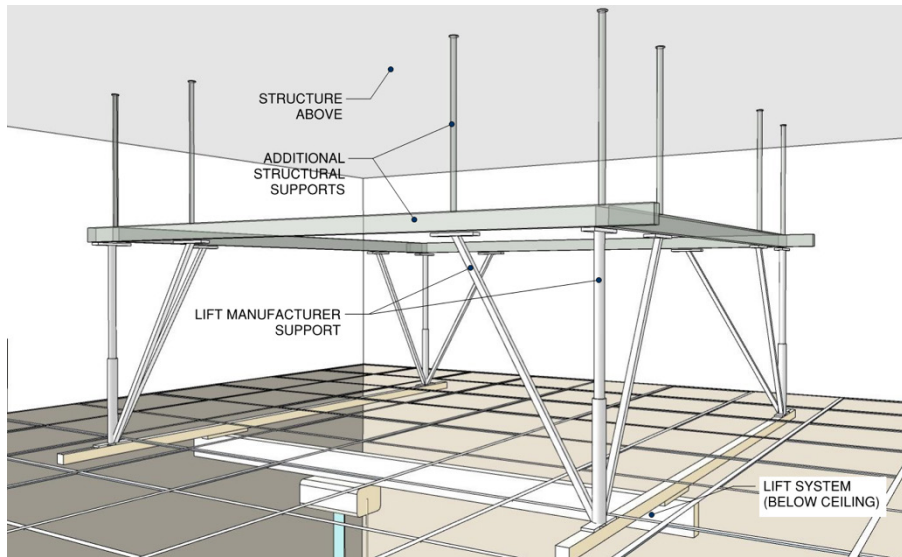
The illustration above represents an additional structural frame for bridging between the manufacturer provided supports and the underside of structure above. The “Additional Structural Support” is designed and installed by a construction contractor separately from the manufacturer. Refer to section 2.8.2.2 for specific structural support installation responsibilities.
